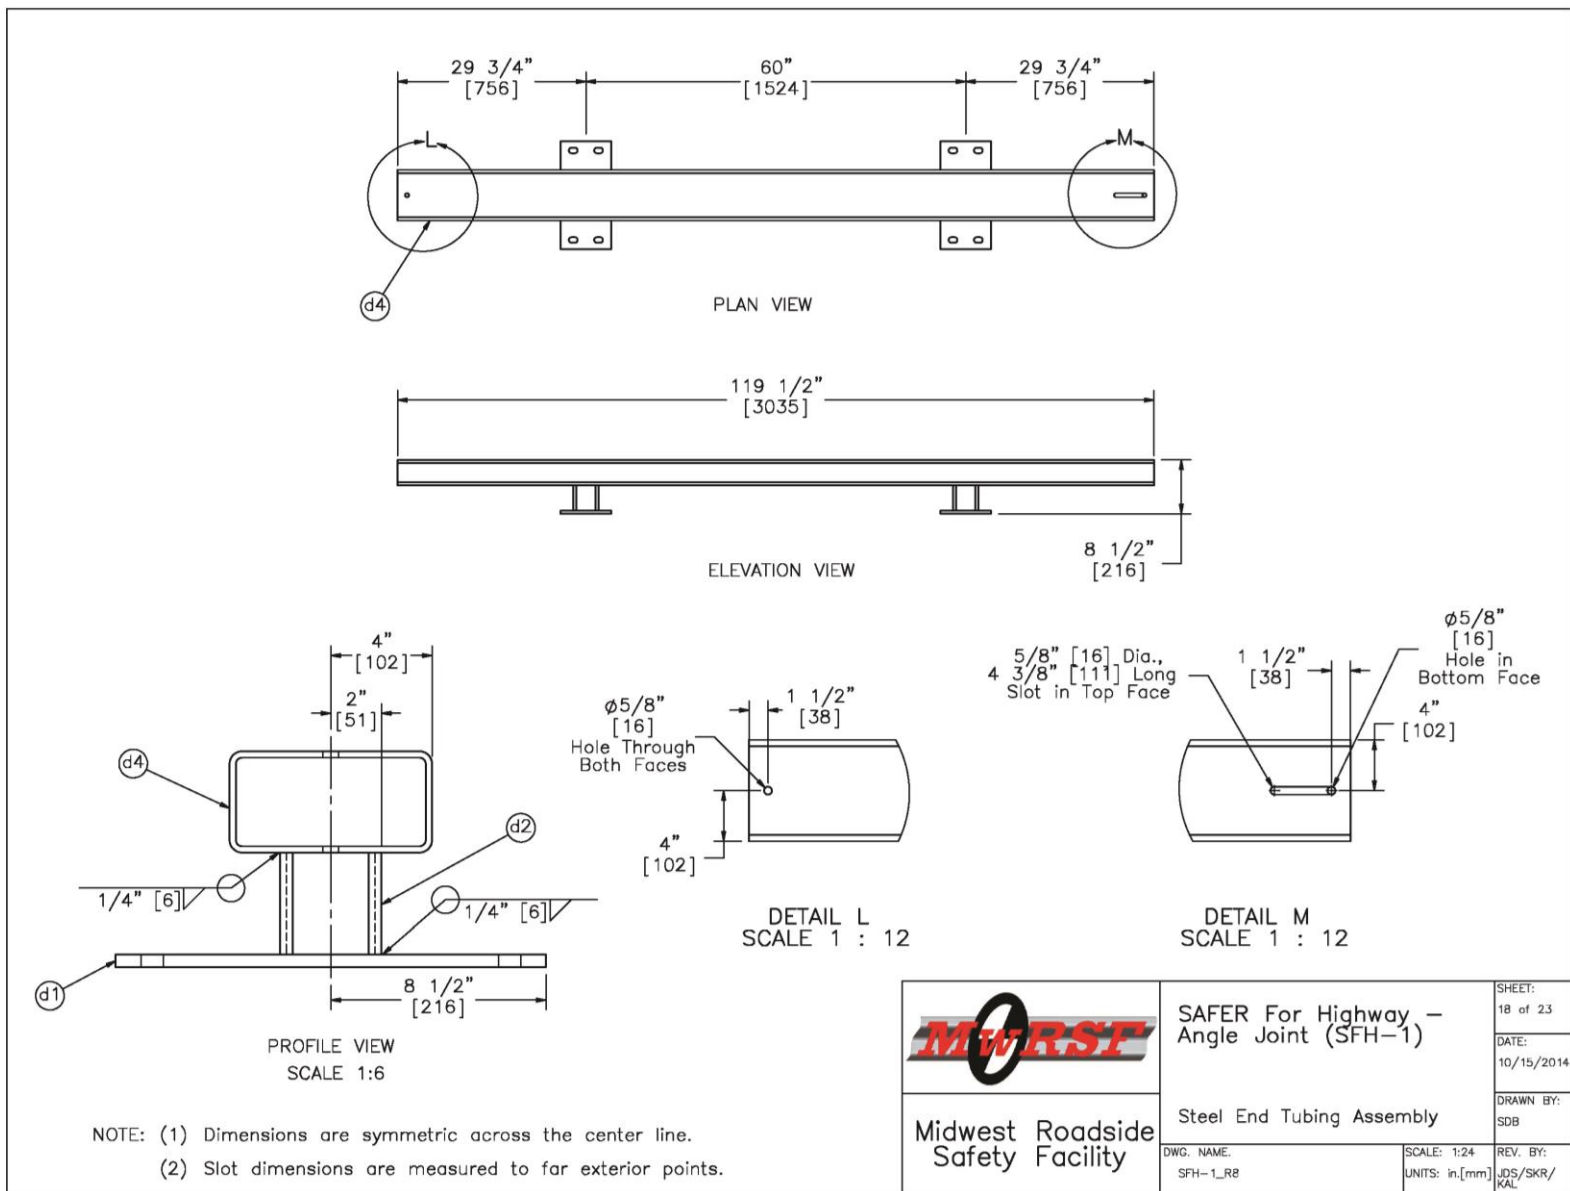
Recommended Barrier Design for Full-Scale Crash Testing, Steel End Tubing Assembly
